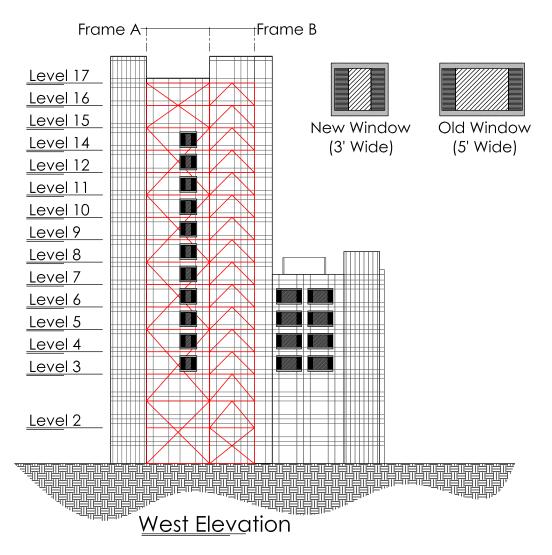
Shown above is the elevation of the exterior face steel framing plan, including braced frames as highlighted. The bracing members require that the windows in the corridor space of the building be reduced to 3' from their original 5' width.
